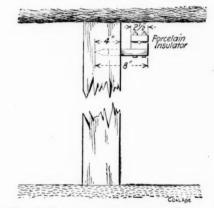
METHOD OF SUPPORTING CABLES FROM PILLARS
